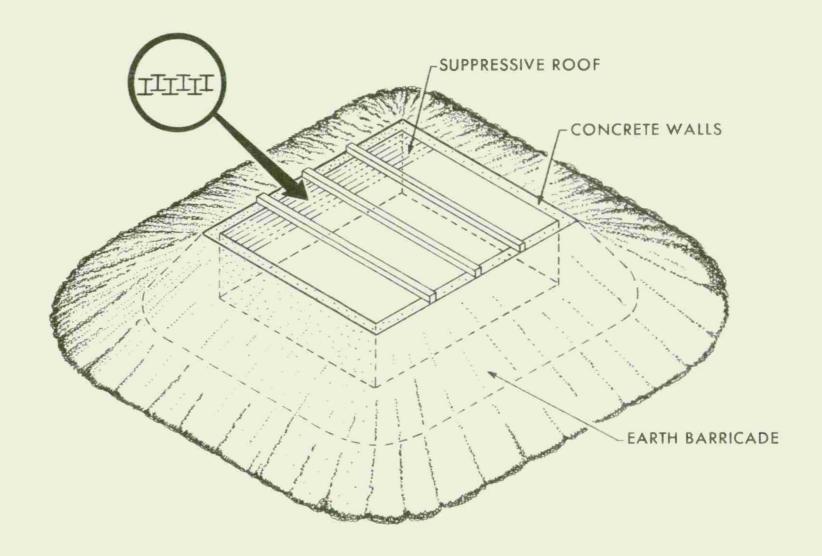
Flat-Type Suppressive Roof with Concrete Walls
